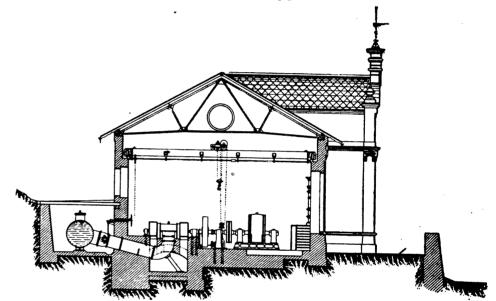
SECTIONAL ELEVATION OF POWER HOUSE, JUNGFRAU RAILWAY.
